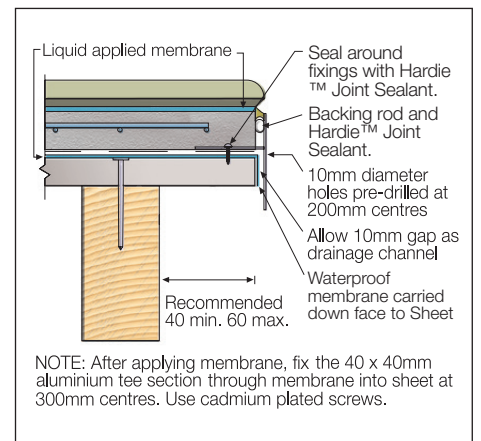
METHOD 2 - DECK EDGE DETAIL USING ALUMINIUM TEE SECTION
